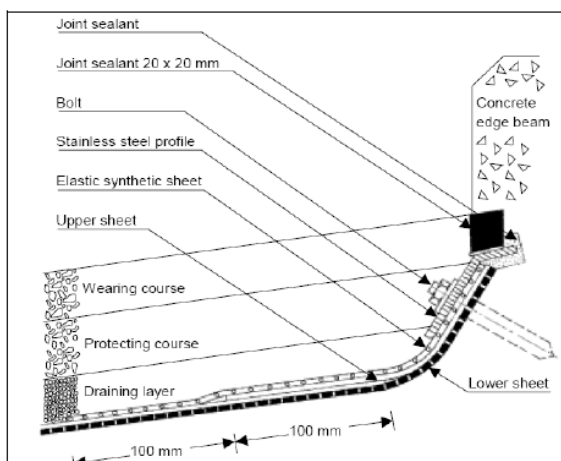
The edge beam where the sheets are fastened with a stainless steel profile to the concrete
